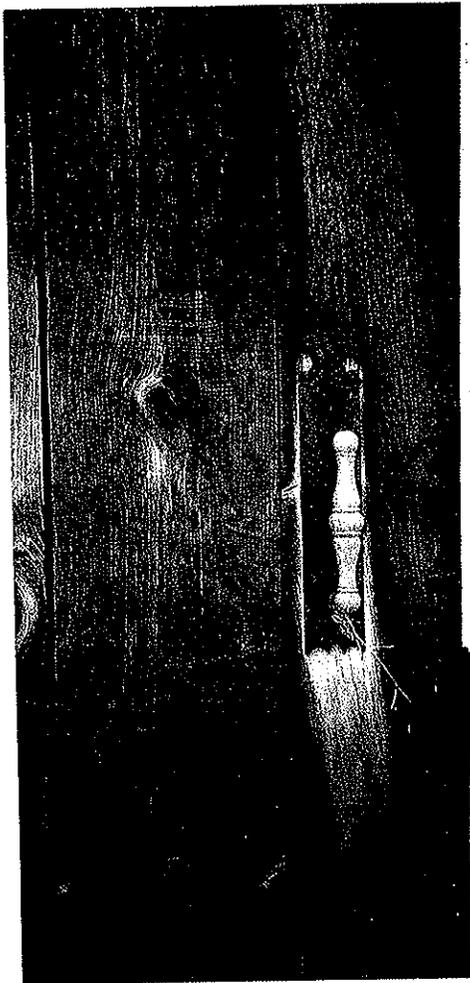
Weir Tack House -- Northwest Wall, Norfolk Latch on Door in Doorway D101 (1995).
